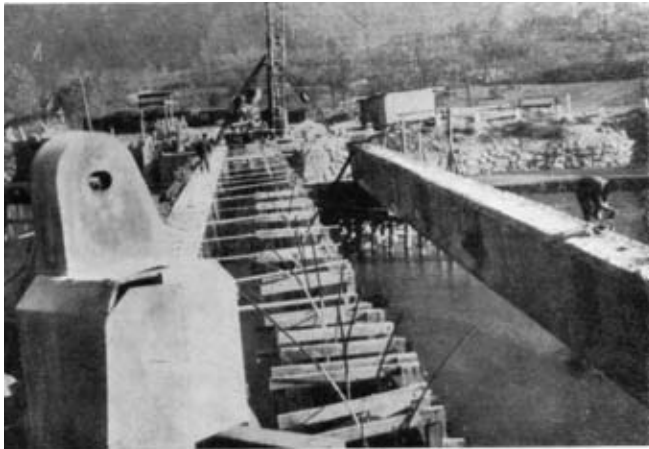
The first beam cast has been shifted to the right in order to clear the concreting stage.
